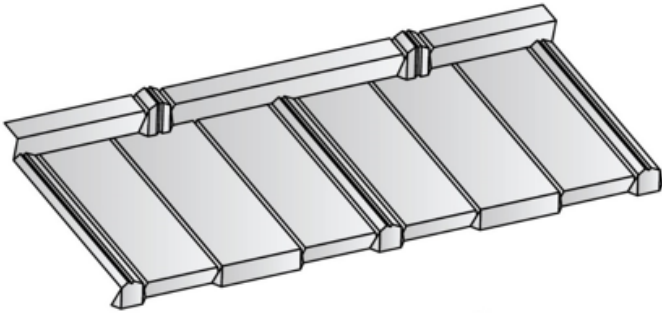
Unified Steel Stone Coated Roofing - PINE-CREST Shake panel
